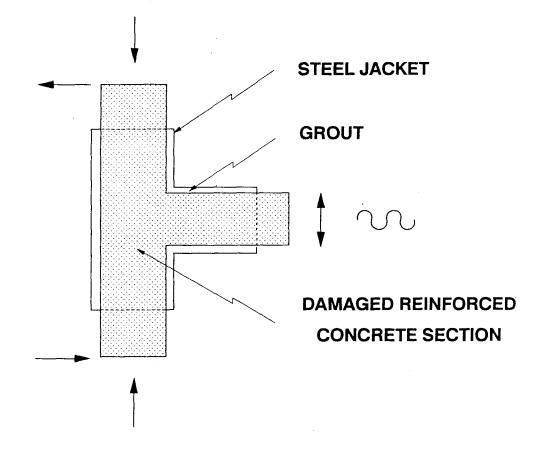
Beam-to-Column Joint Cyclic Loading Test
